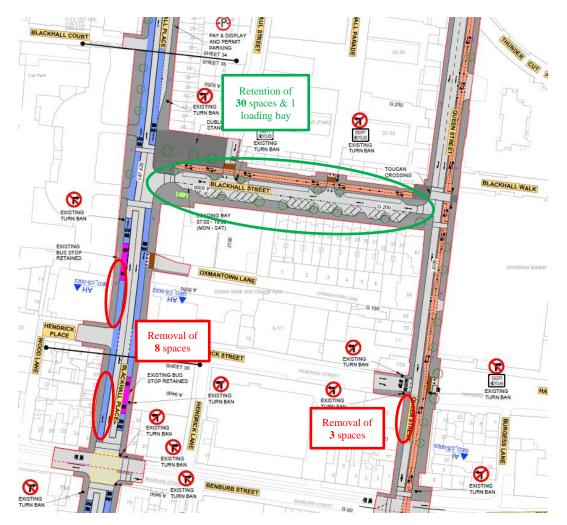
Proposed scheme design parking changes for Queen Street, Blackhall Street, and the southern section of Blackhall Place
